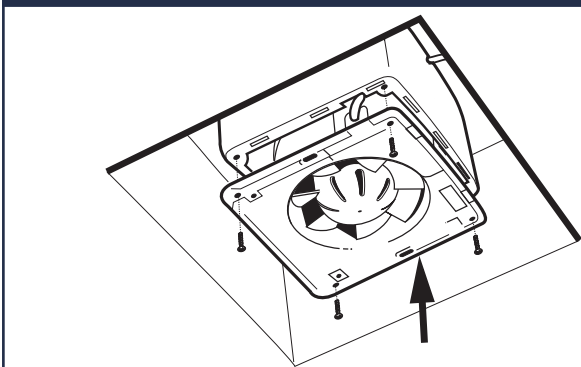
Fit the grille to the fan, locating the top lip before fixing
